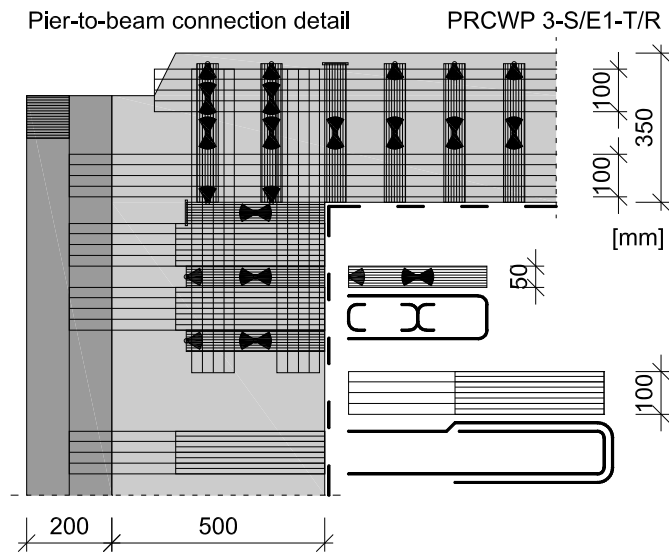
FRP layout detail at the pier-to-beam connection of PRCWP 3-S/E1-T/R
